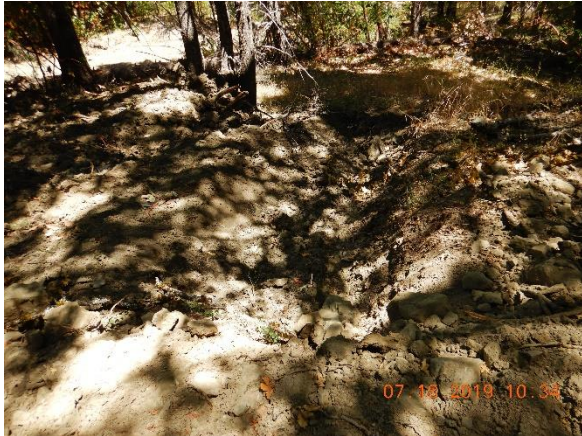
Sediment in Class 3 (Crossing 3) Photo 23 – Road prism built in Crossing 3
